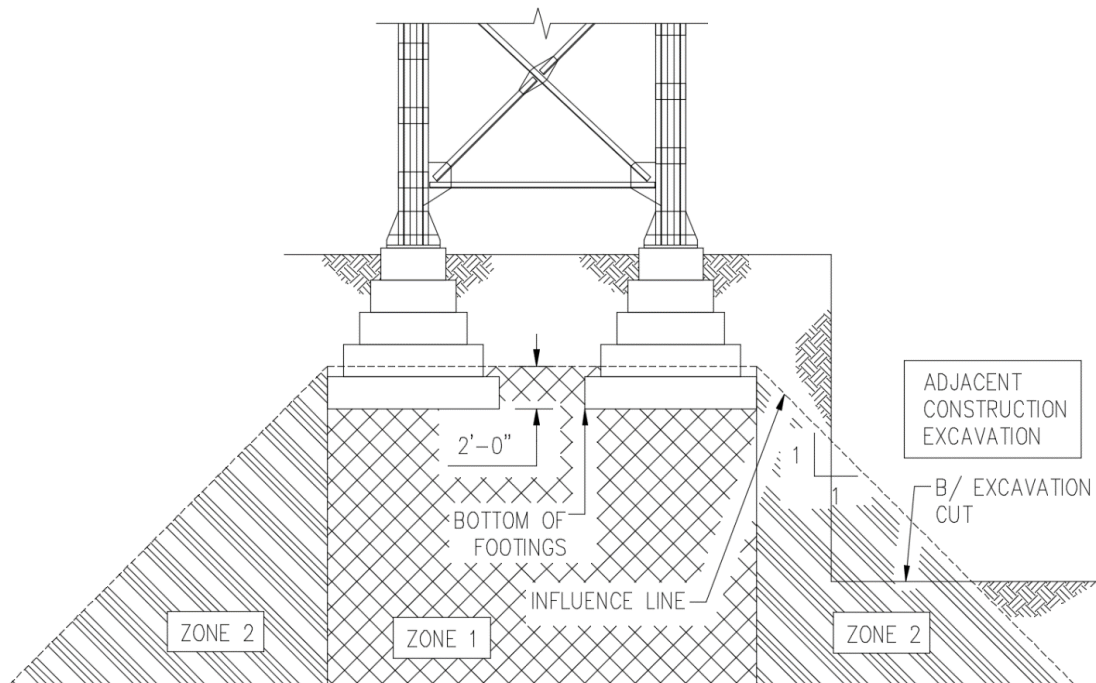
4: Elevated Track Structure Footing Zone of Influence
